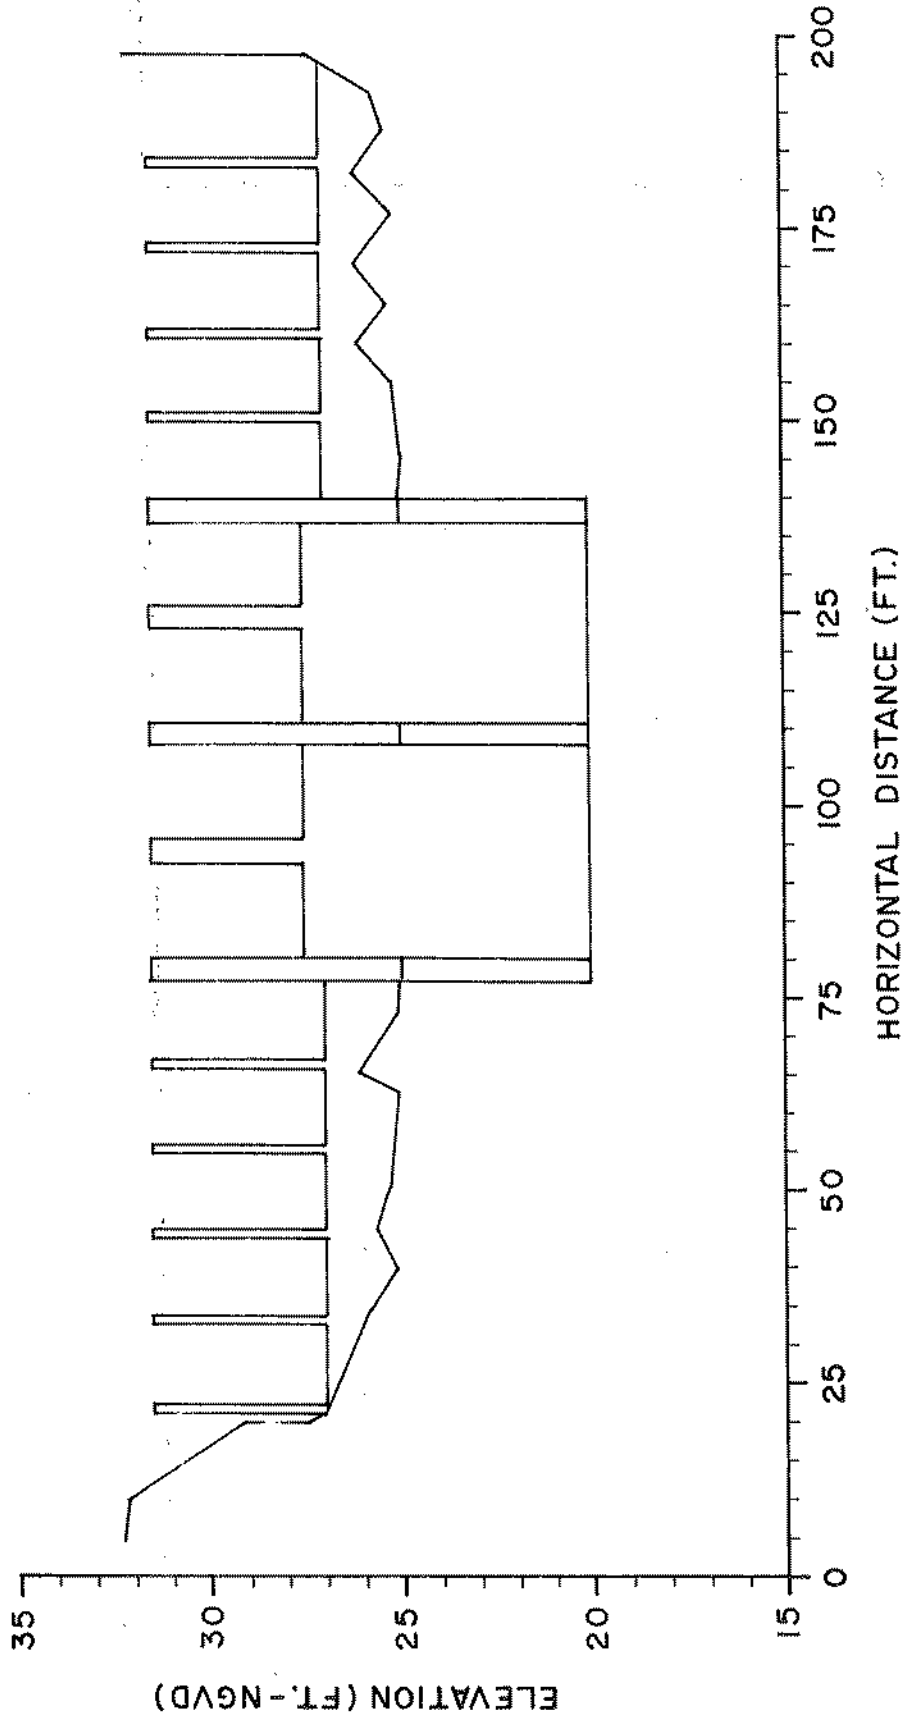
Vertical Section of Lake Munson's Outfall Structure
